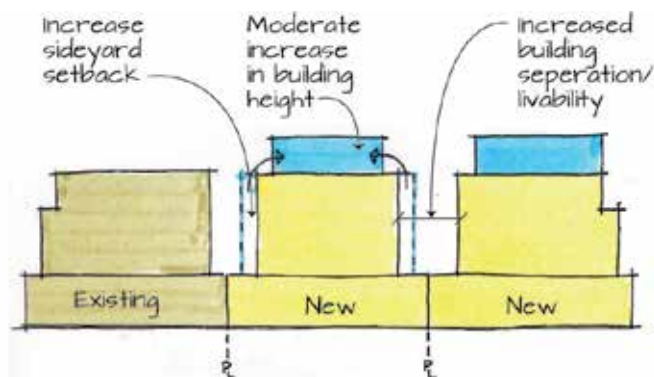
Building Separation for Taller Buildings, northwest part of Cathedral Hill: At a given density, modest increase in height can support greater building separation and more slender buildings, enhancing livability for current and planned future residences
